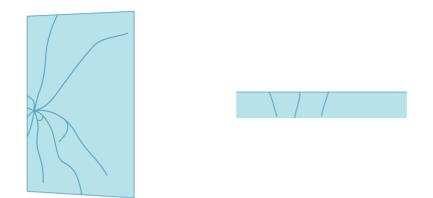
Striking the edge (hitting the glass surface, e.g. hitting the pane strip with a hammer).
